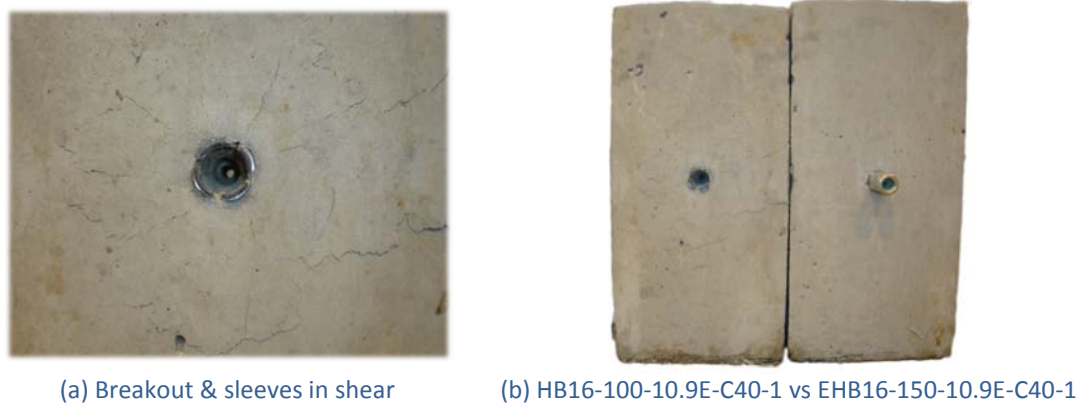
Failure mode of internal bolt grade 10.9 in type *HB
